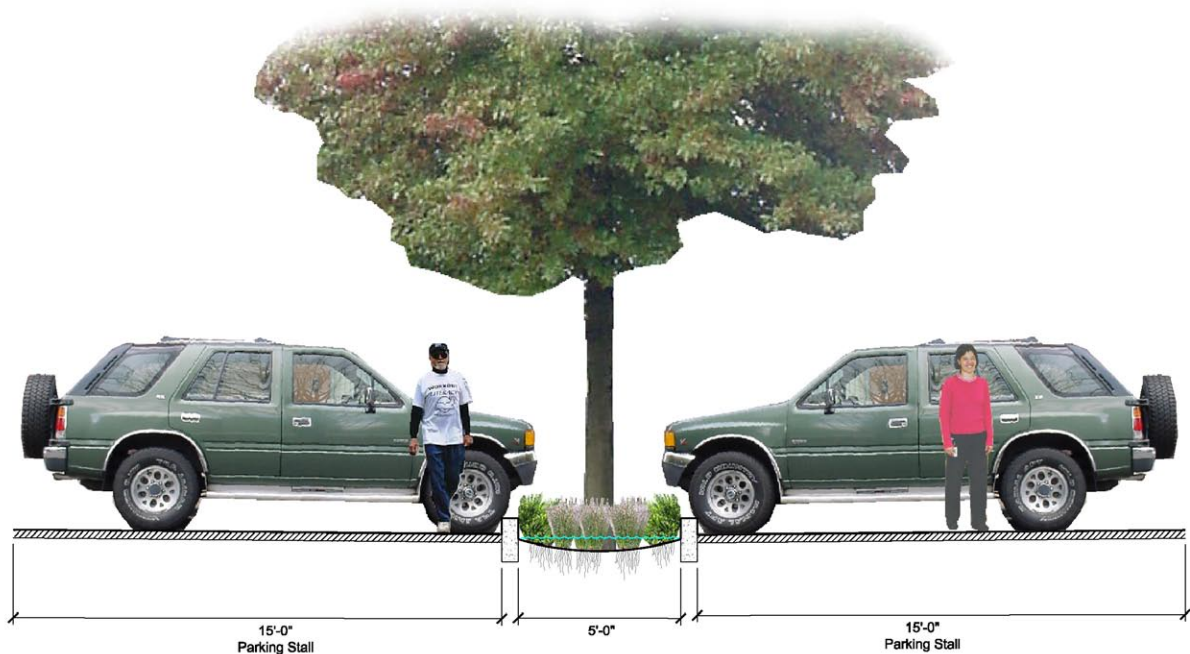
This cross section shows how a 15 feet parking stall can help create room for landscaping used for stormwater management. Note that the parked cars in both scenarios are placed in the same place and fit within reduced length the parking stalls.
